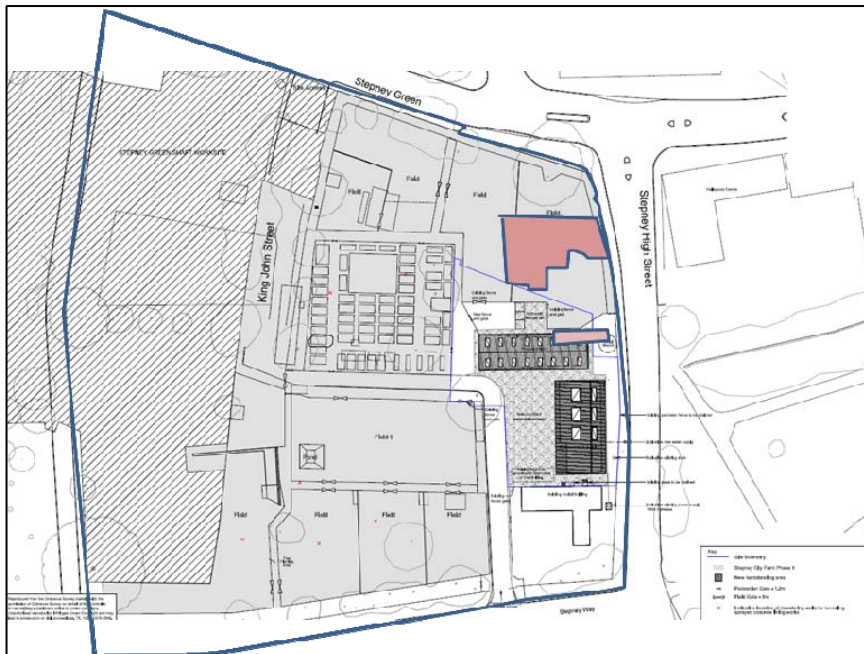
Areas of previous excavation (Pink) by Peter Mills in 1979 overlaid on location of proposed buildings
